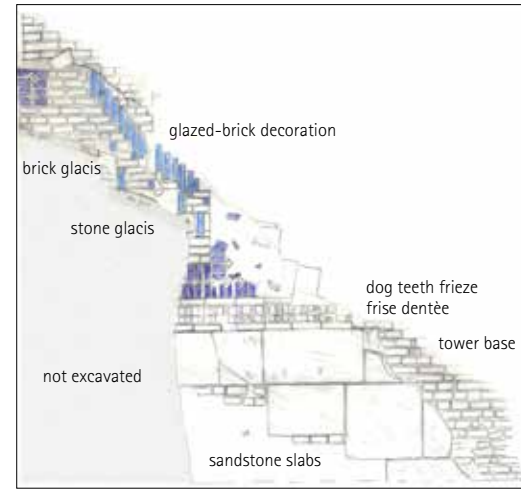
Eastern tower, decoration elements of the façade, developed drawing (detail)
